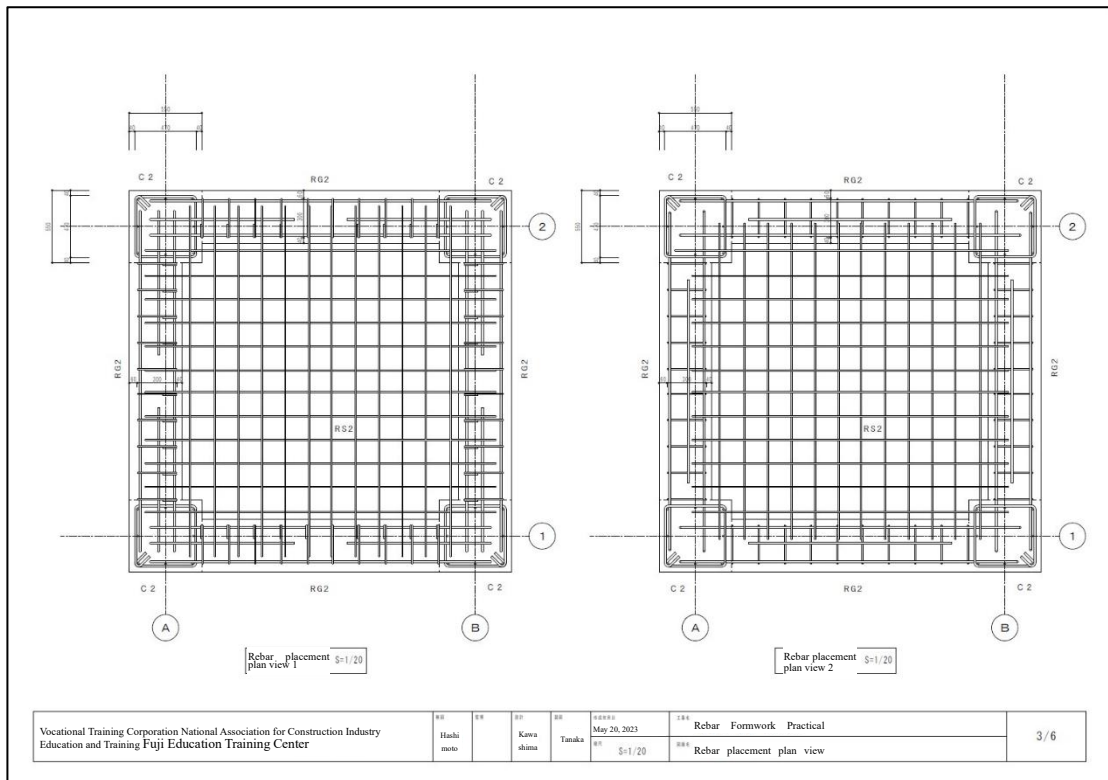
Construction drawing example: pillar/slab reinforcement plan
